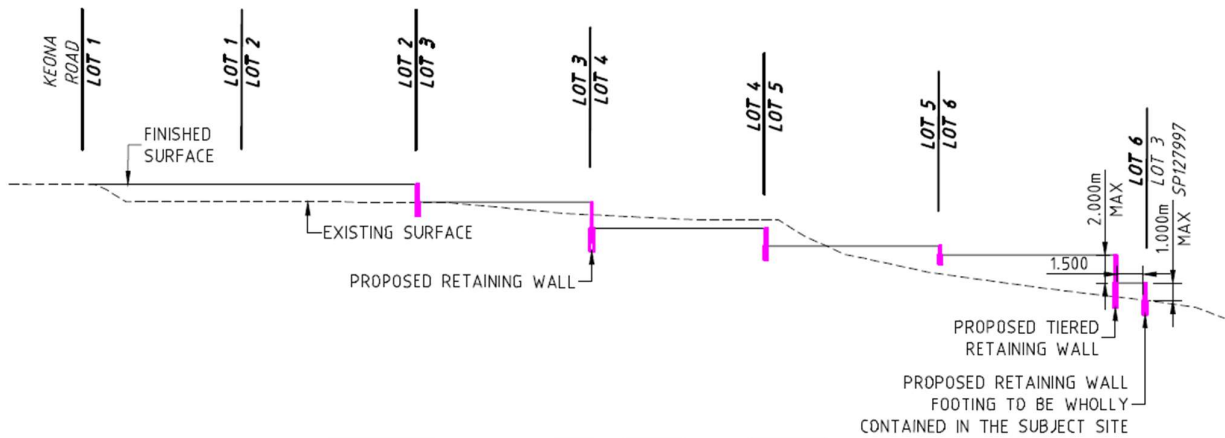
Section D of Civil Engineering plans showing stepped retaining
